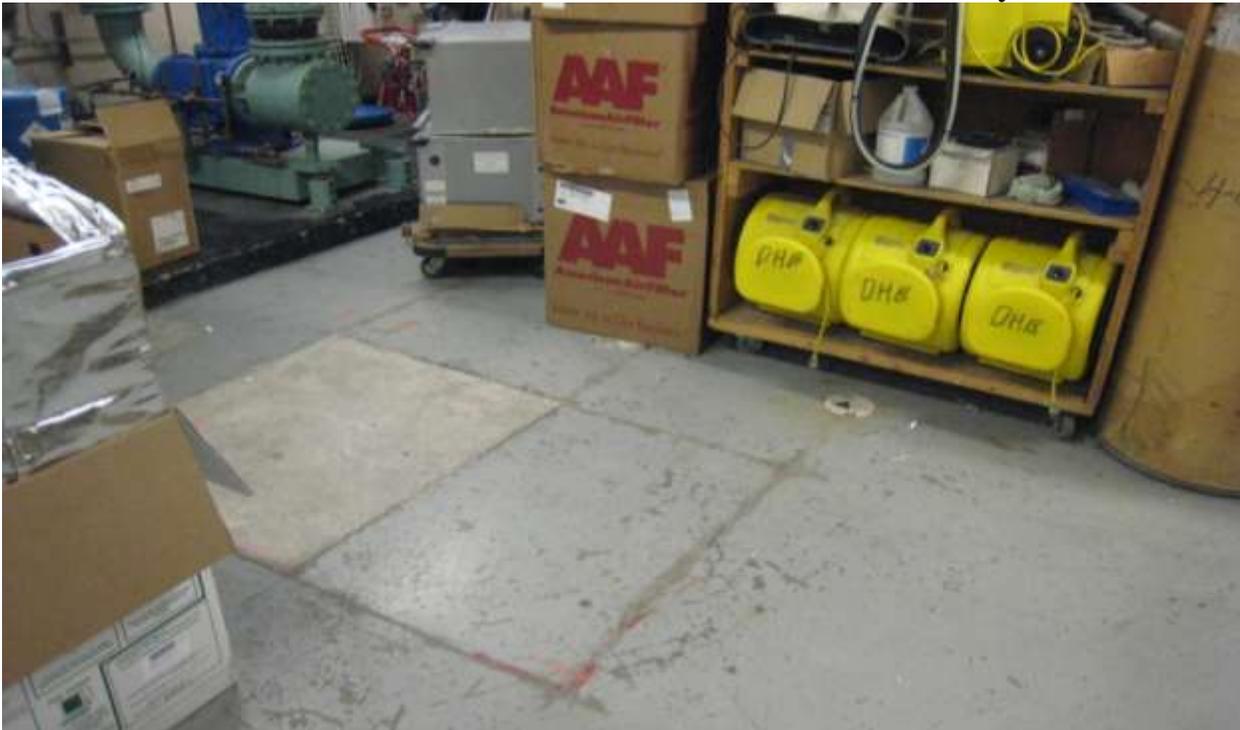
Another tank access cutting in bike storage room – well at top middle of picture
